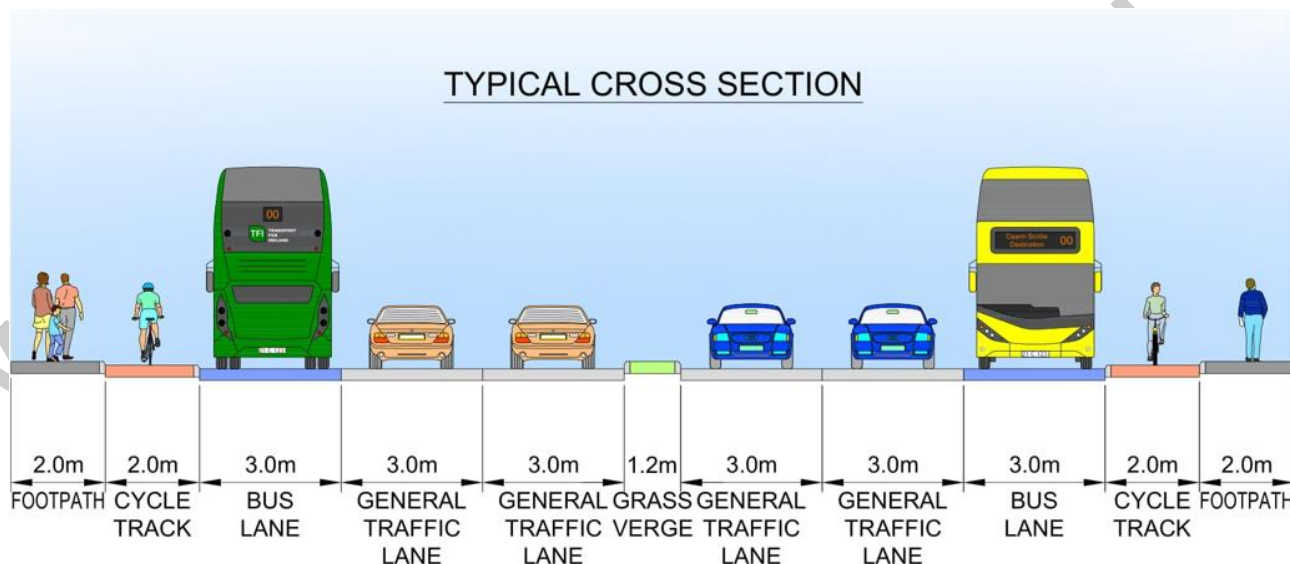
Section 1, Proposed Option 5 – Cross Section B-B
